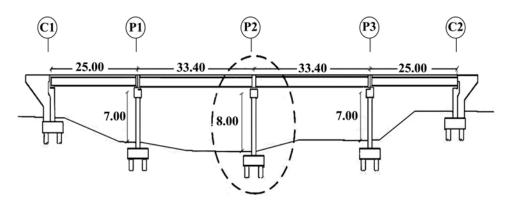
Elevation of a sample bridge 1 with a circular pier type
